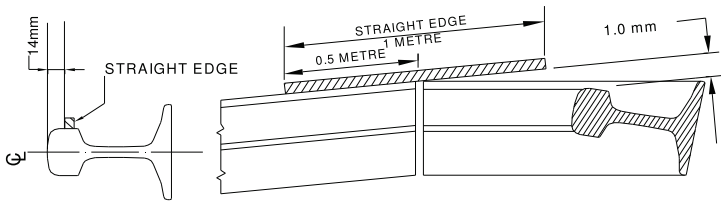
(a) Tolerance for Lateral Misalignment at the Time of Welding
